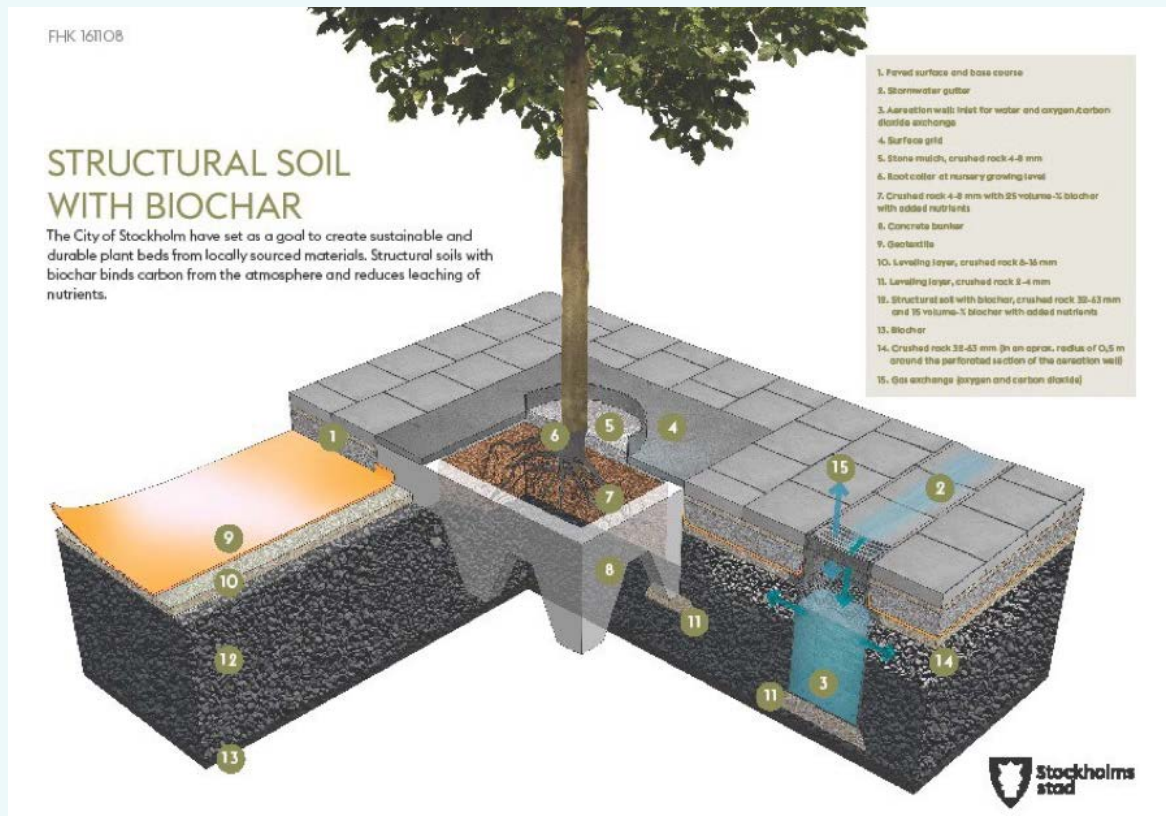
Visualisation of underground structural soil, drainage system and tree roots.
